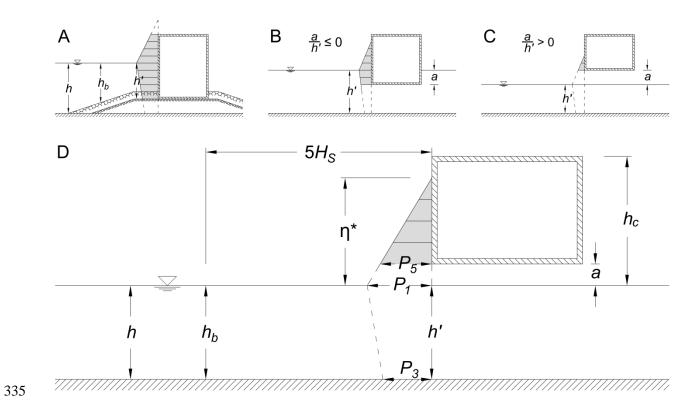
Schematics of the Goda wave pressure distribution applied to: A) original application to a caisson type breakwater; B) modified for a structure submerged below sea level $(a/h' \le 0)$; and C) modified for a structure elevated above sea level (a/h' > 0). D) Detail of C for a structure elevated above sea level with labeled parameters.
